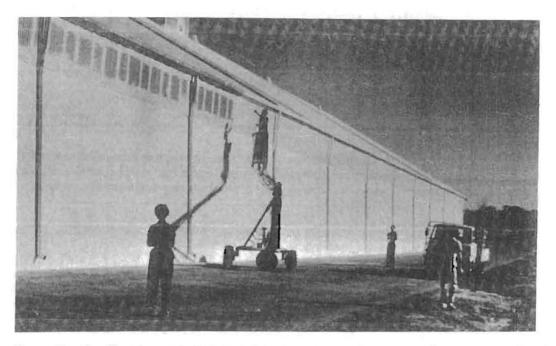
Application of final coat of reflectant material over previously sealed roof and wall at Meckering.
